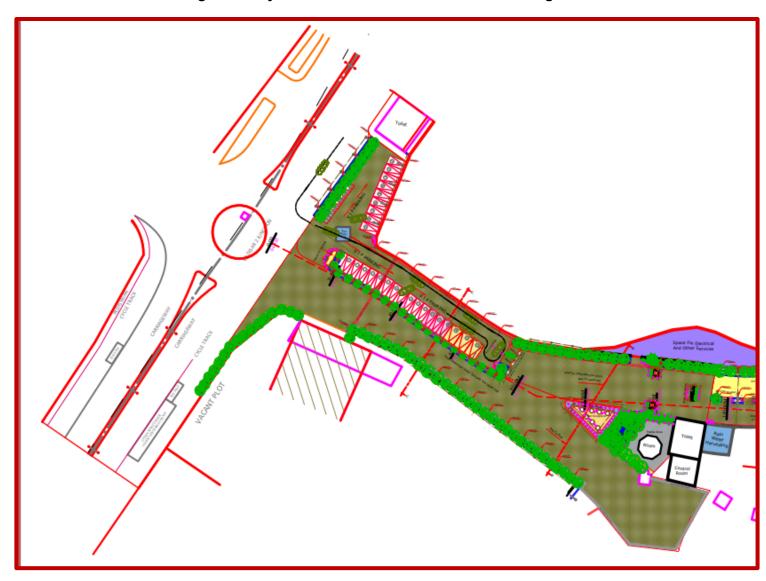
Layout Plan for Entrance Plaza and Parking Area
